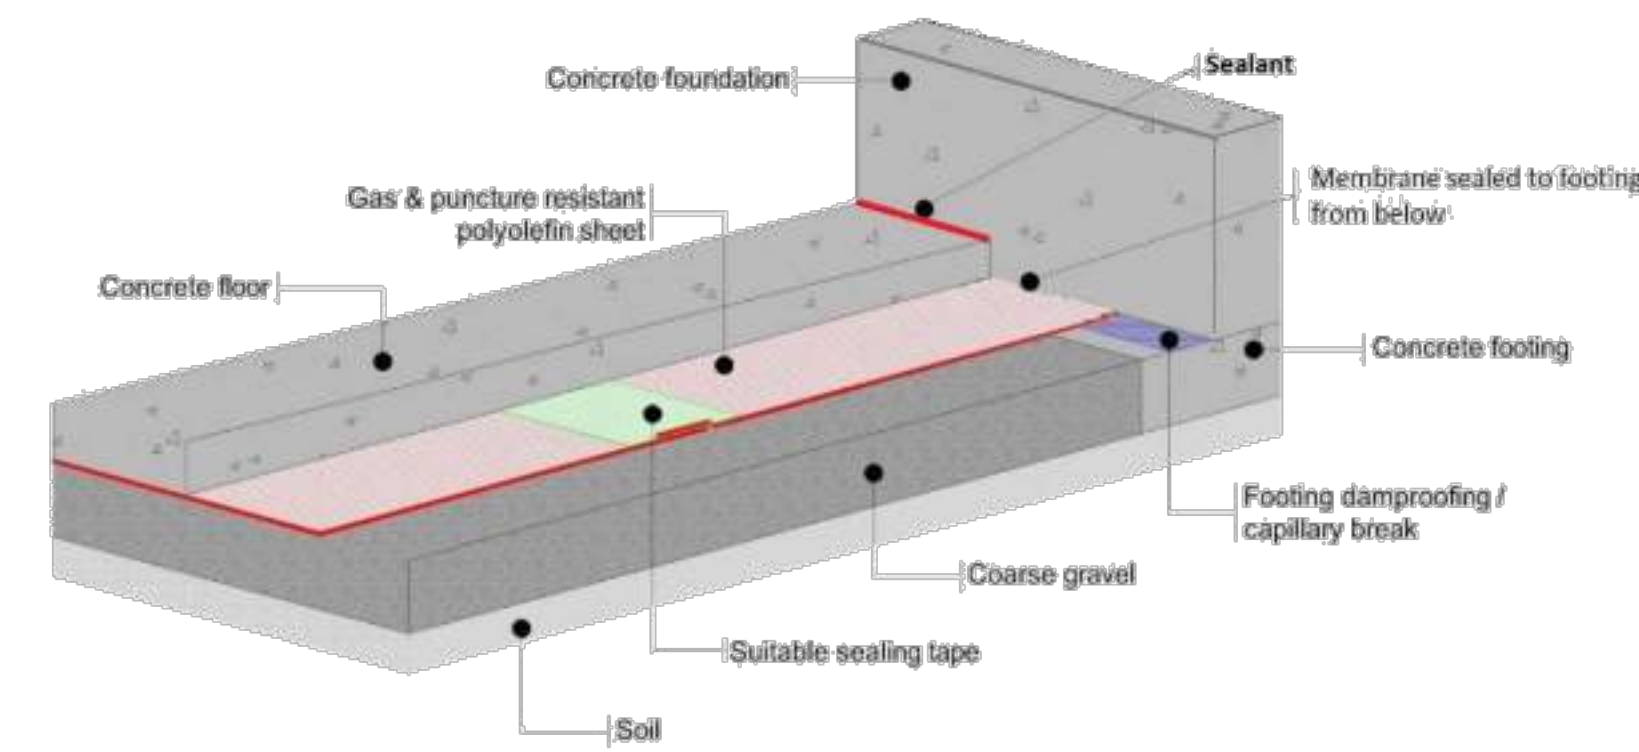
Sealing sub-slab membrane horizontally to concrete footing prior to slab pour and of the slab/wall expansion joint after the slab pour
